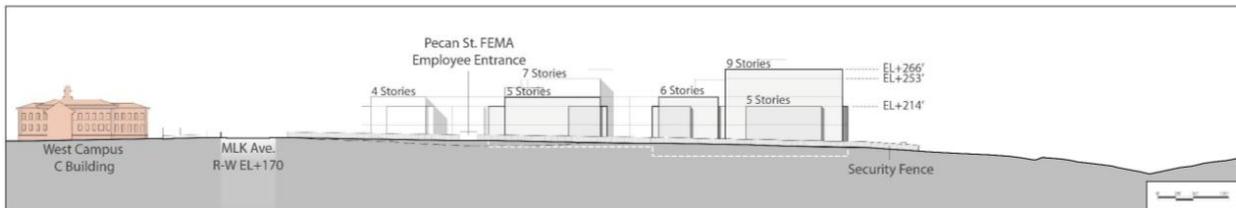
Elevation Study 3 – View North Along Pecan Street
